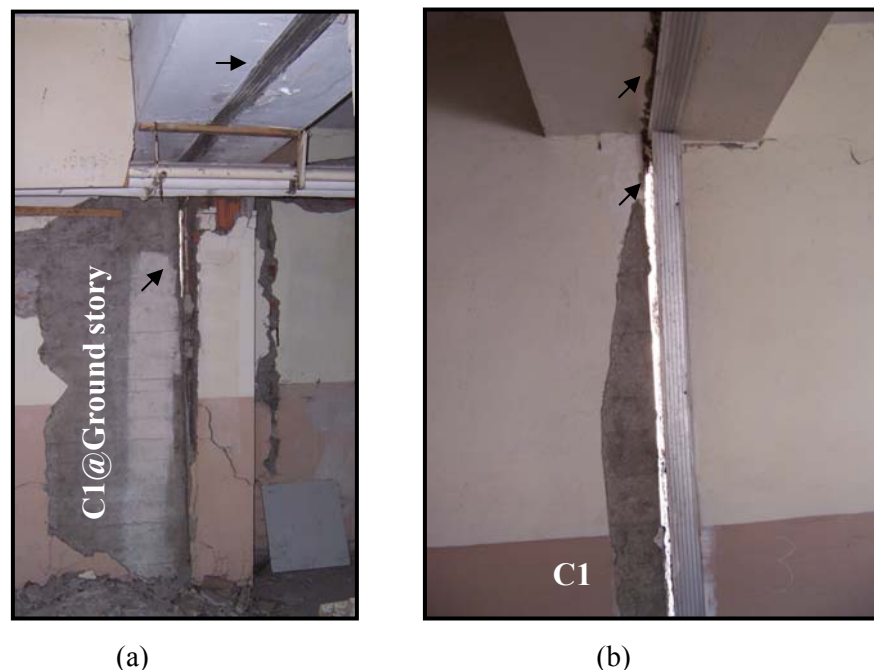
Seismic joints between the case-study building and ground-plus-three story building at the (a) ground and (b) third floor levels in Bolu
